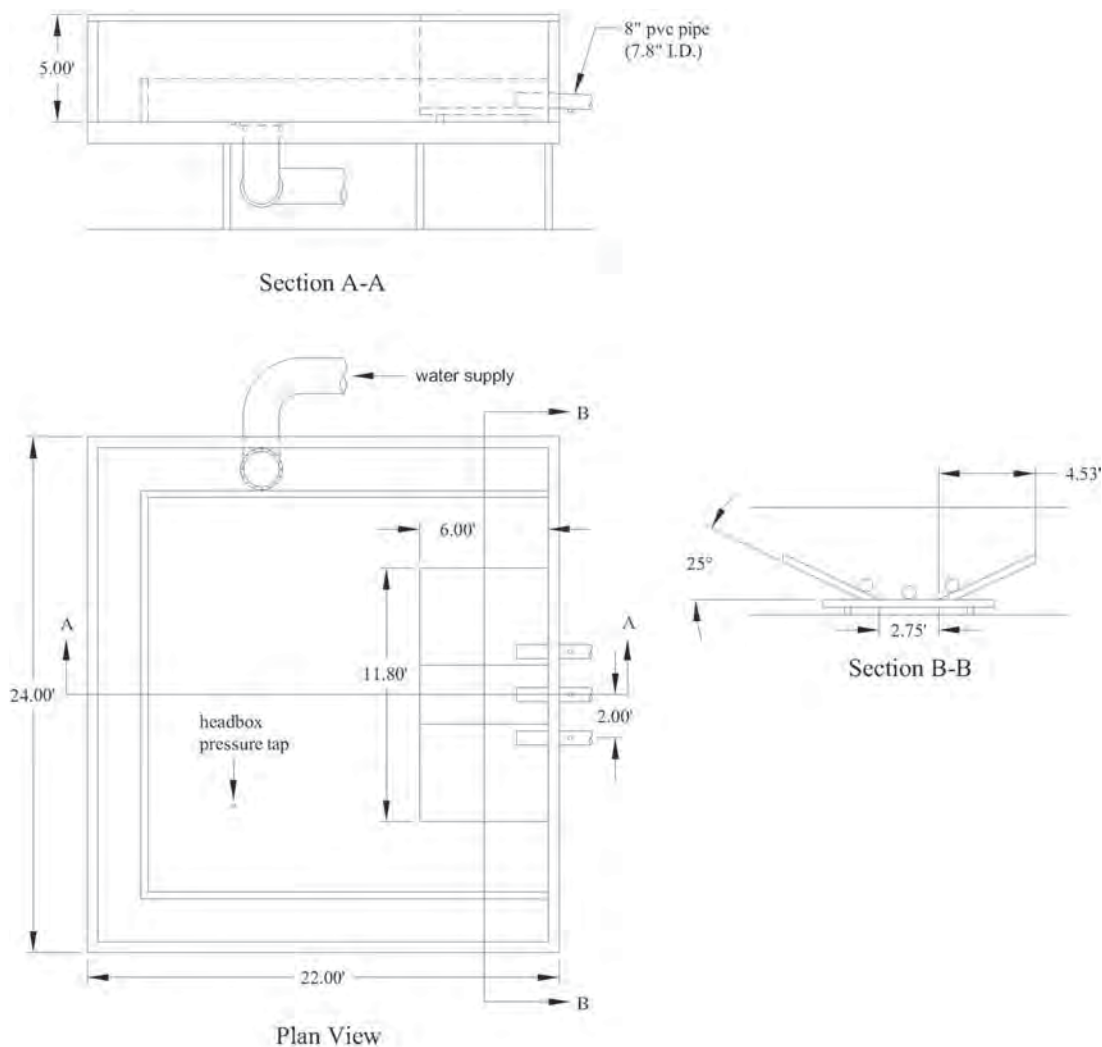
(B). Multibarrel culvert configuration with 3D horizontal barrel spacing and a trapezoidal approach channel.
